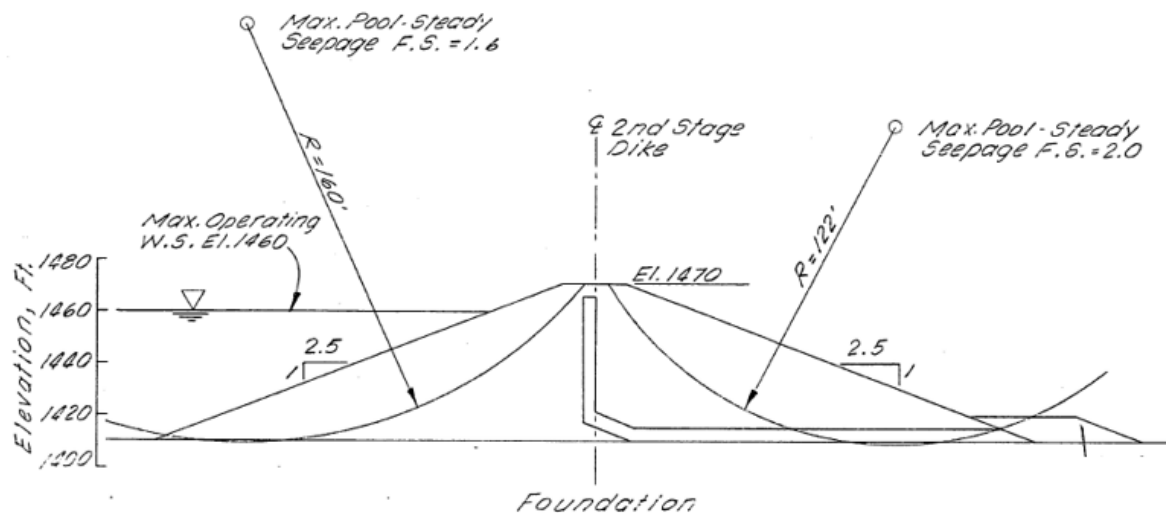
Typical Cross Section of Stage 2 Exterior Perimeter Dam
